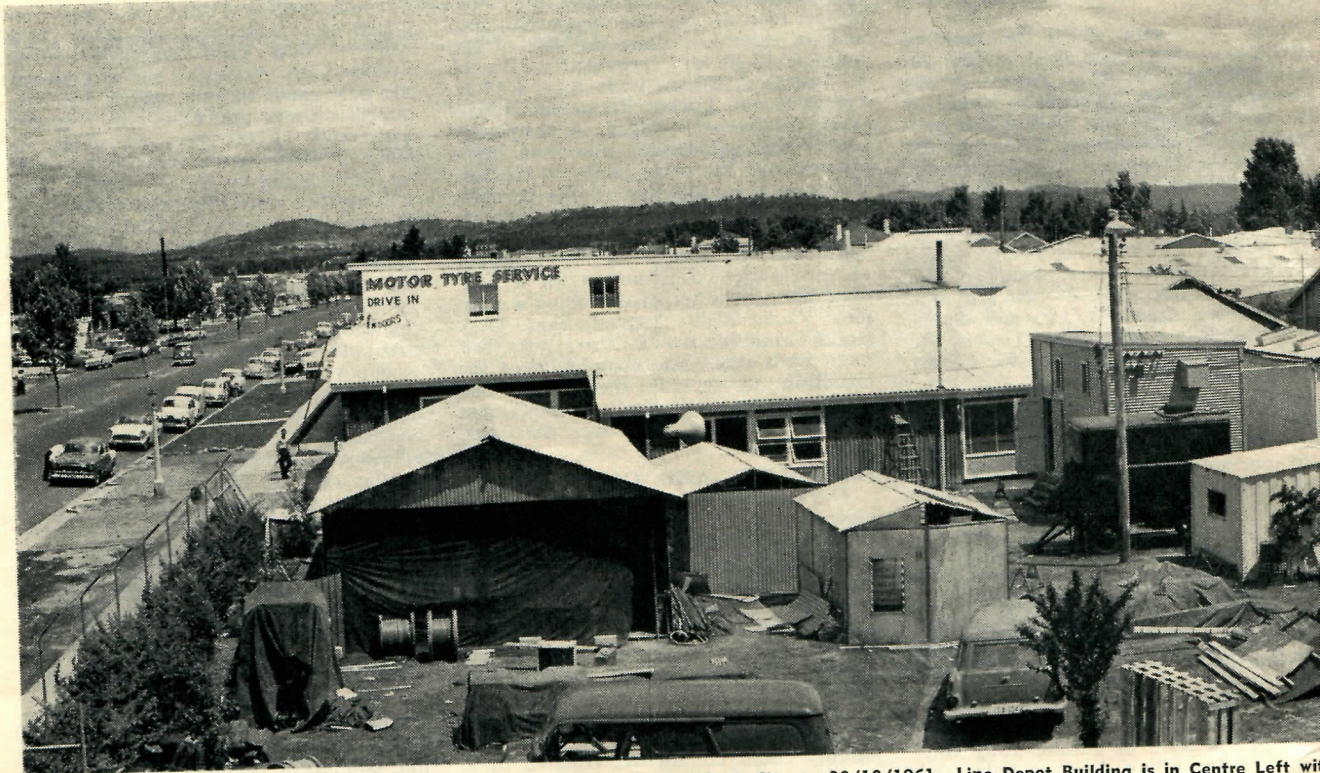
General View of Civic Site on 30/10/1961. Line Depot Building is in Centre Left with Extensions Complete, Temporary Installation Store is in Bottom Left, with Ironworkers Shop adjacent. Portable Exchanges are in Centre Foreground.
